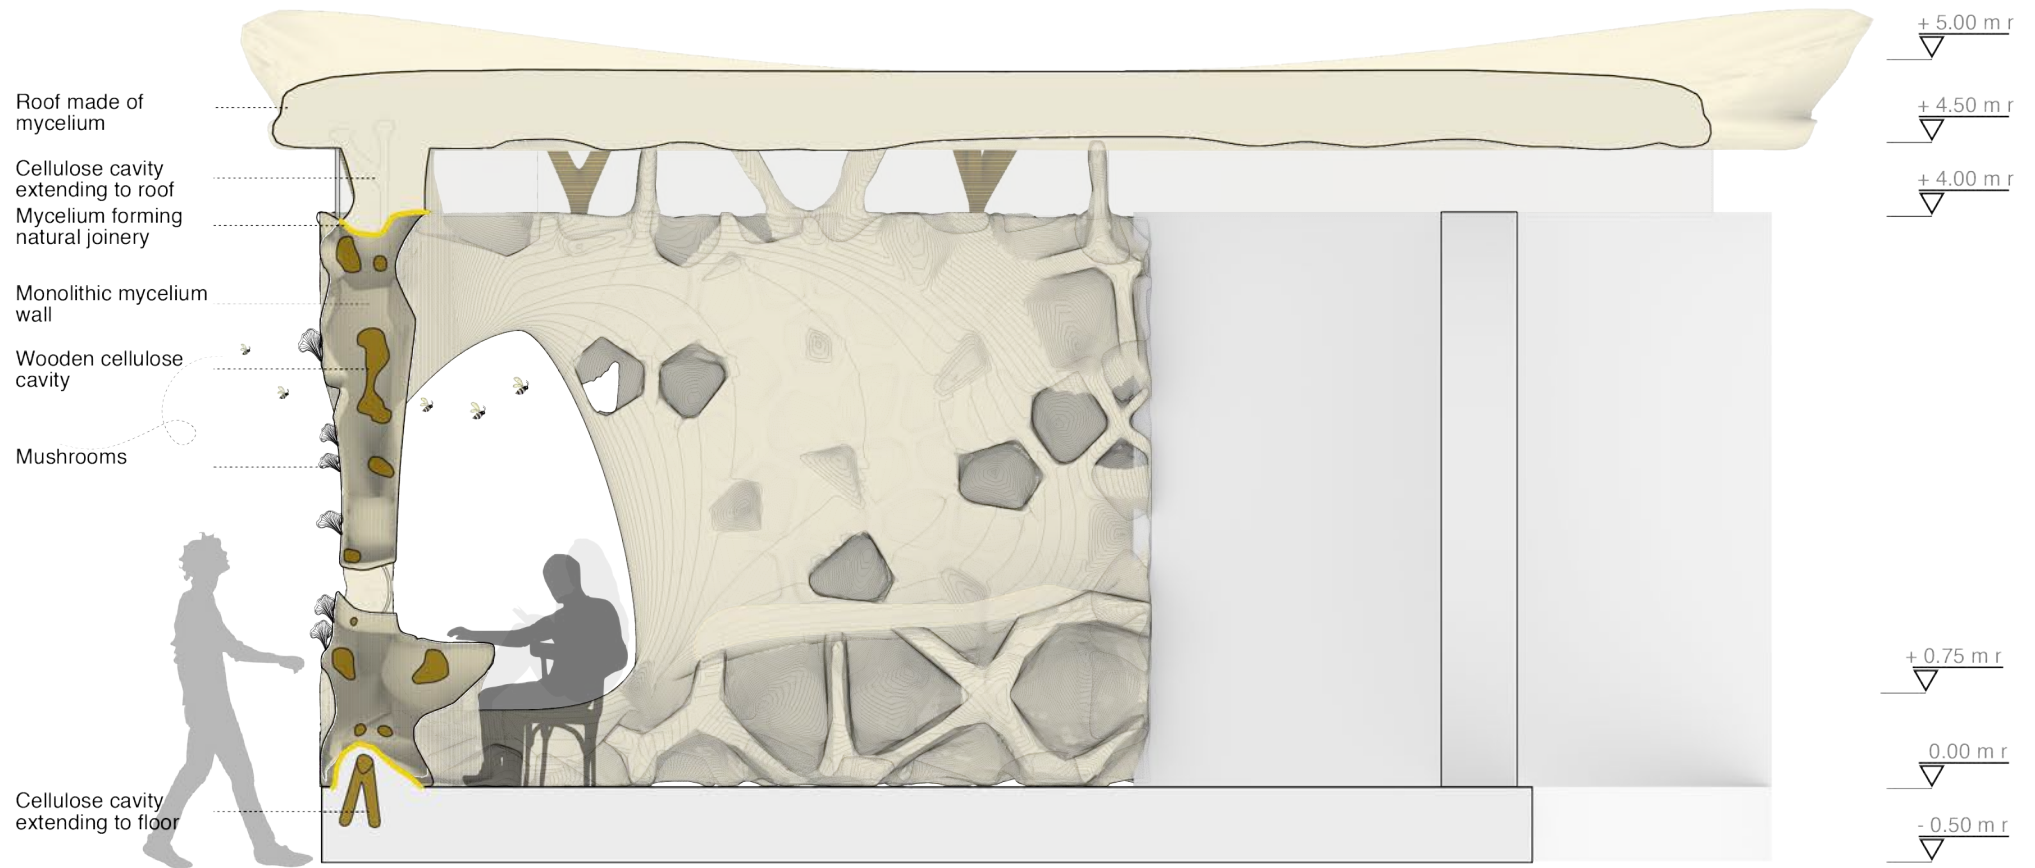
New section (1) of C-Hive project - Scale 1 : 50
